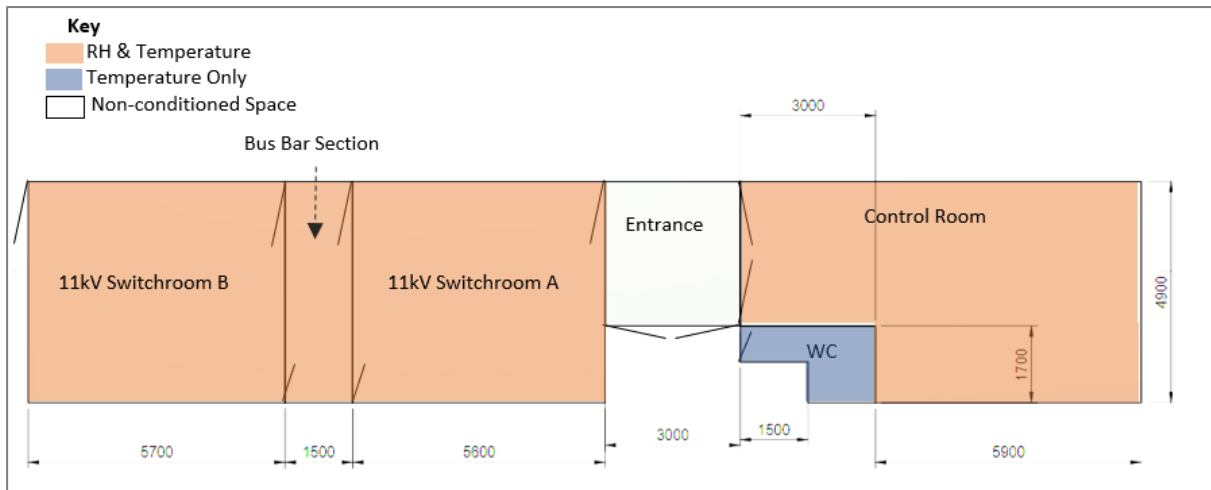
Southeast Macclesfield Floor Plan Showing Level of Conditioning Required Throughout Substation
